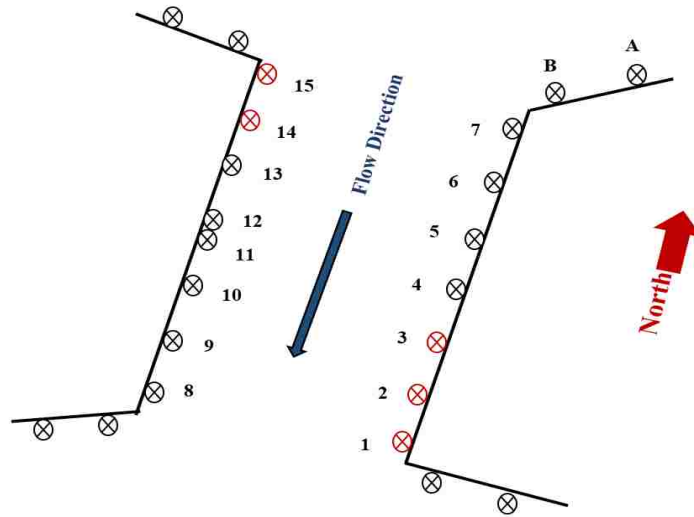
Piles Distributed Plan and Locations of Tested Piles of Bridge #6922
